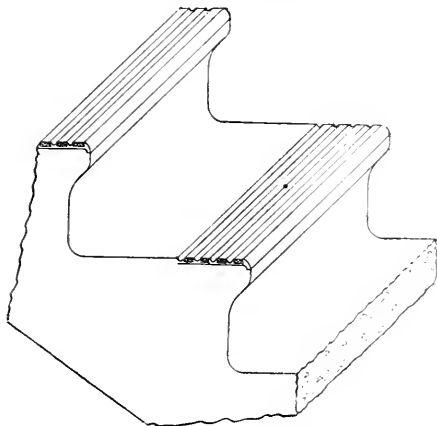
LEAD SAFETY TREAD IN CONCRETE STAIRS
